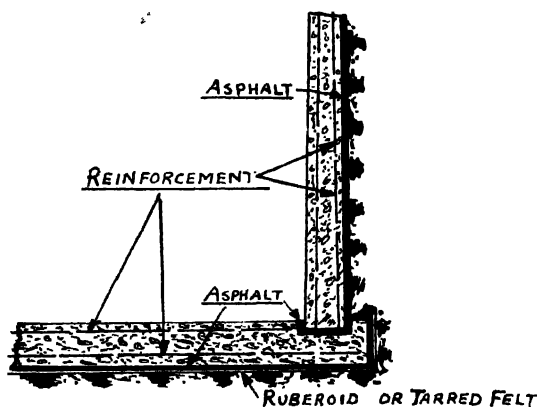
SINGLE SHELL TANK CONSTRUCTION
